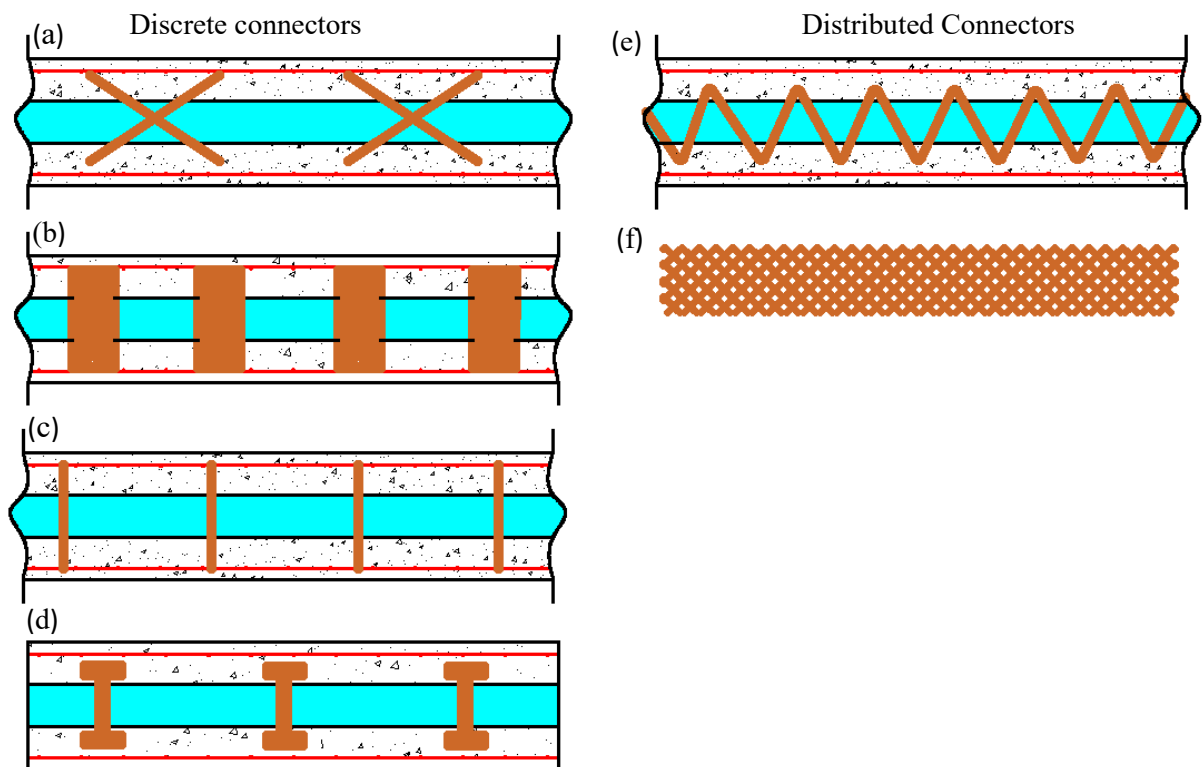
Insulated concrete walls with different connector types (a,b,c,e shown along the wall length, with (d) along the wall width) (a) truss bar connectors (b) Plate-type connectors (c) Pin-type connector (d) Profiled Connector (I-section) (e) Bent bar truss connector (f) Grid type truss connector
